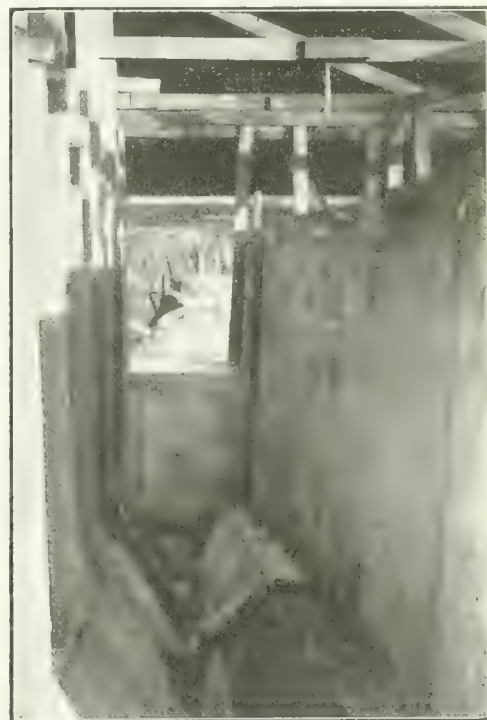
Showing Formwork and Drains; One Grit Chamber Under Construction.
